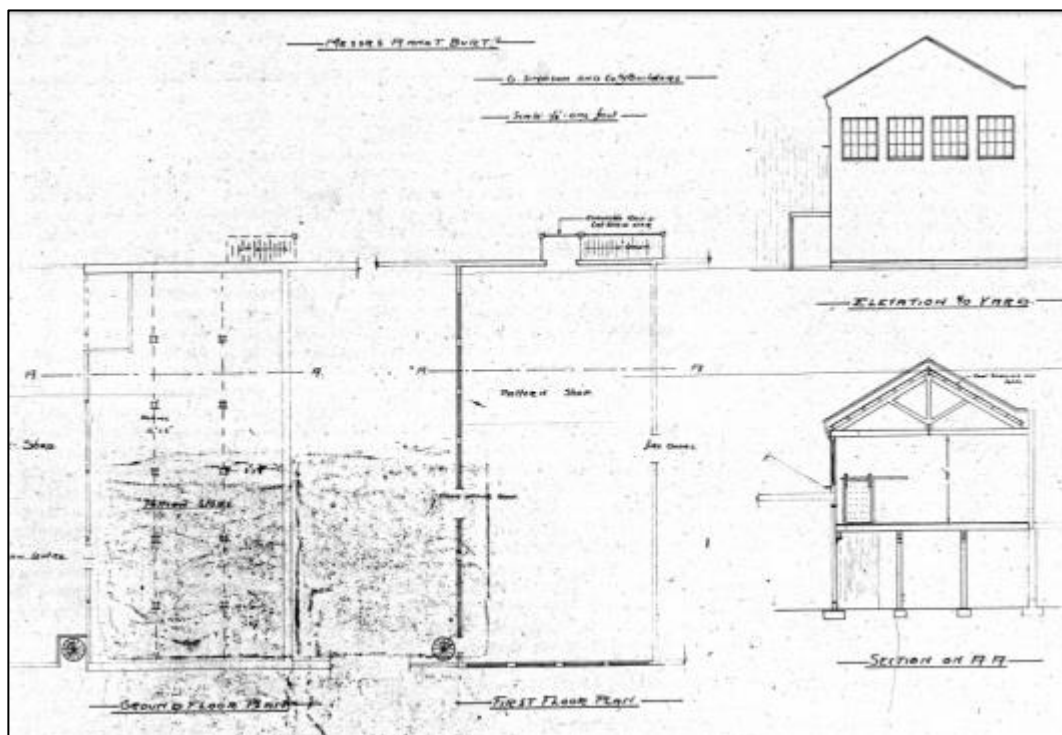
1918 plans for a new pattern shop and store on Section 69 (DCC Archives).
